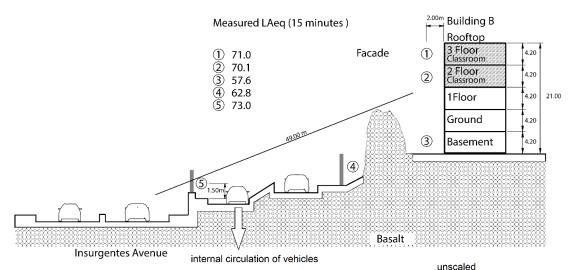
Side view of the location of Building B measuring points of outside noise and distance to Insurgentes Avenue
